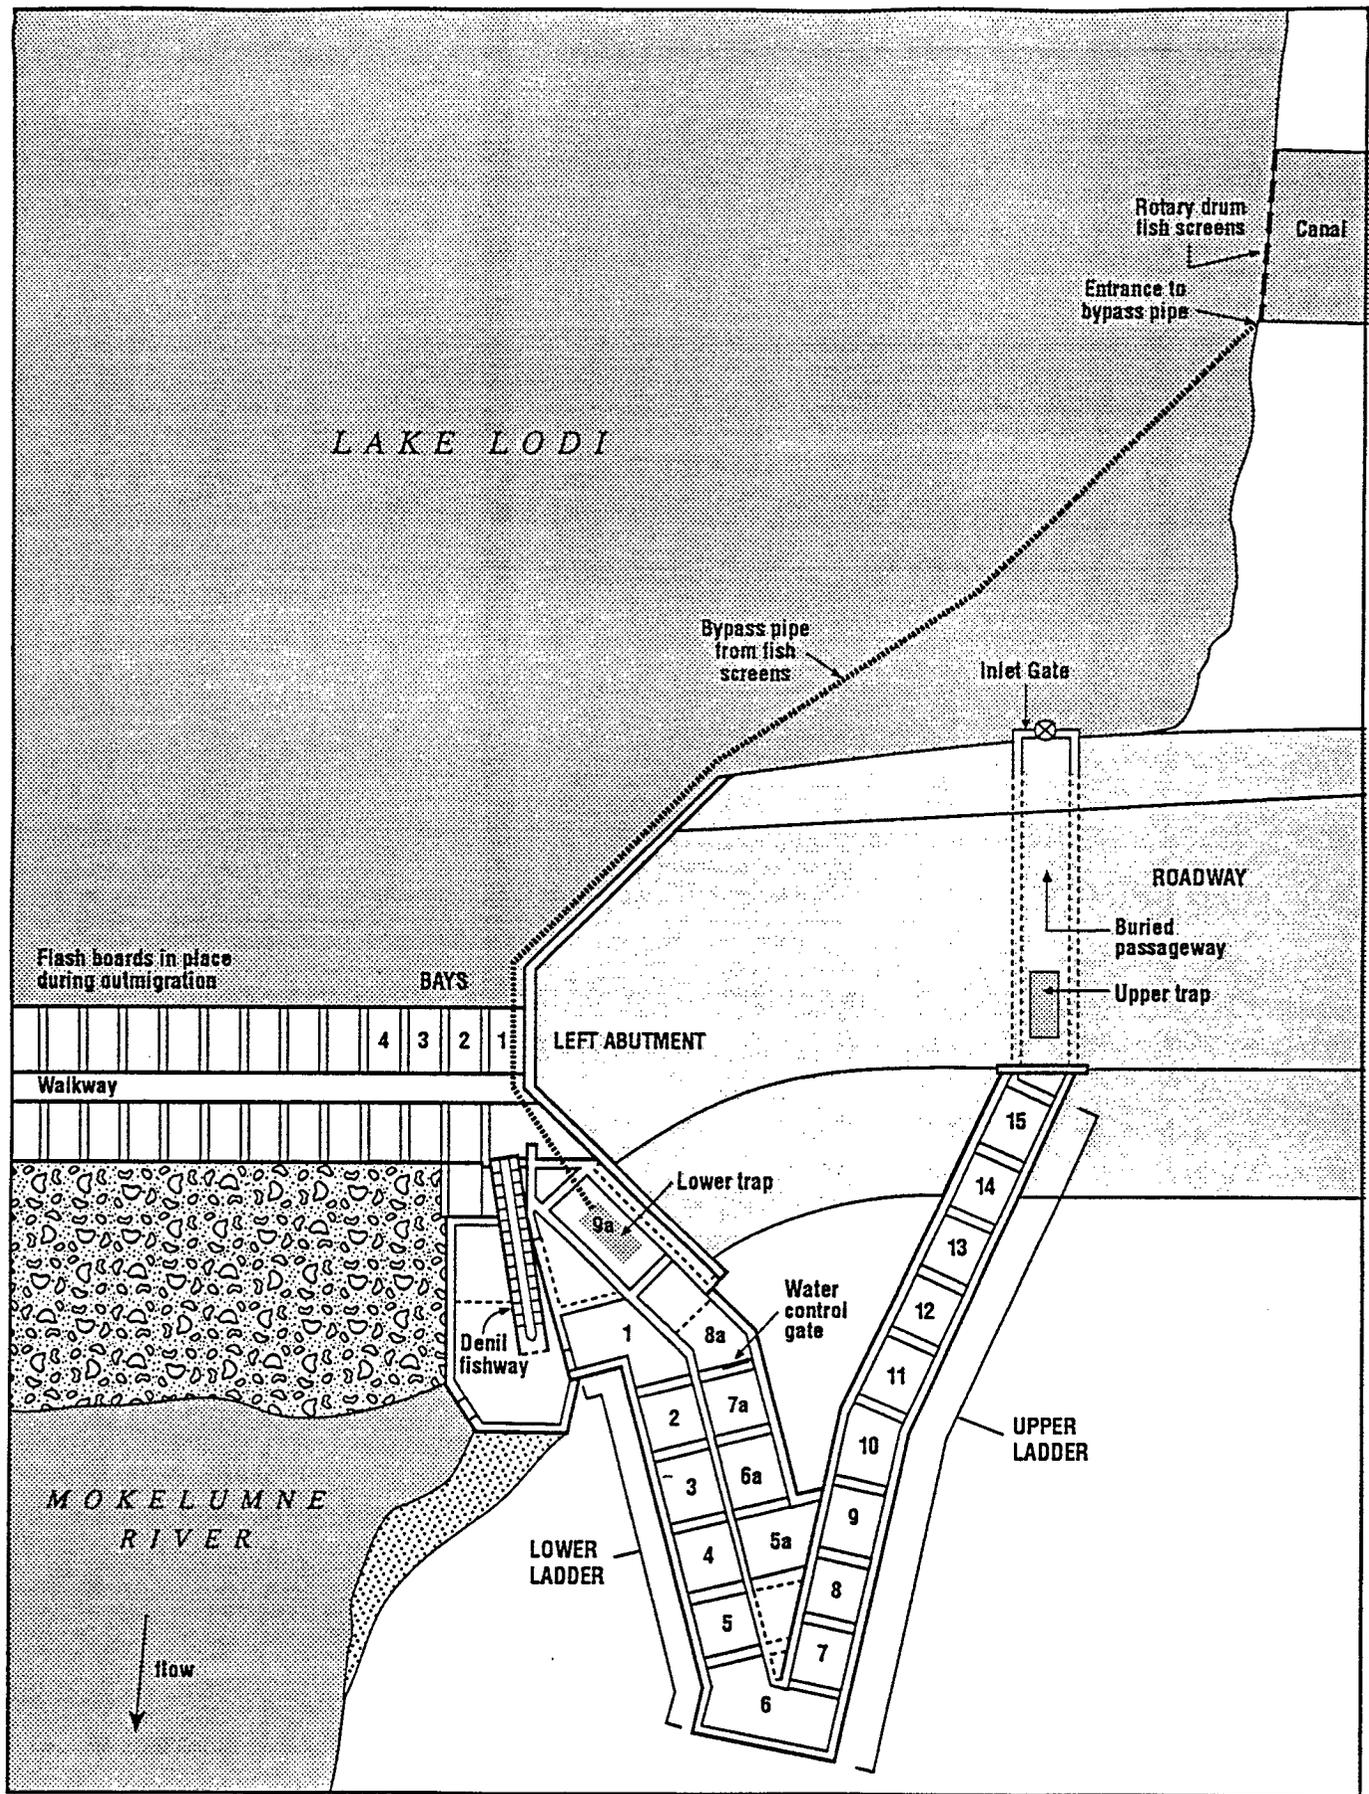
Plan view of Woodbridge Dam showing fish ladders and lower and upper smolt outmigration traps.
